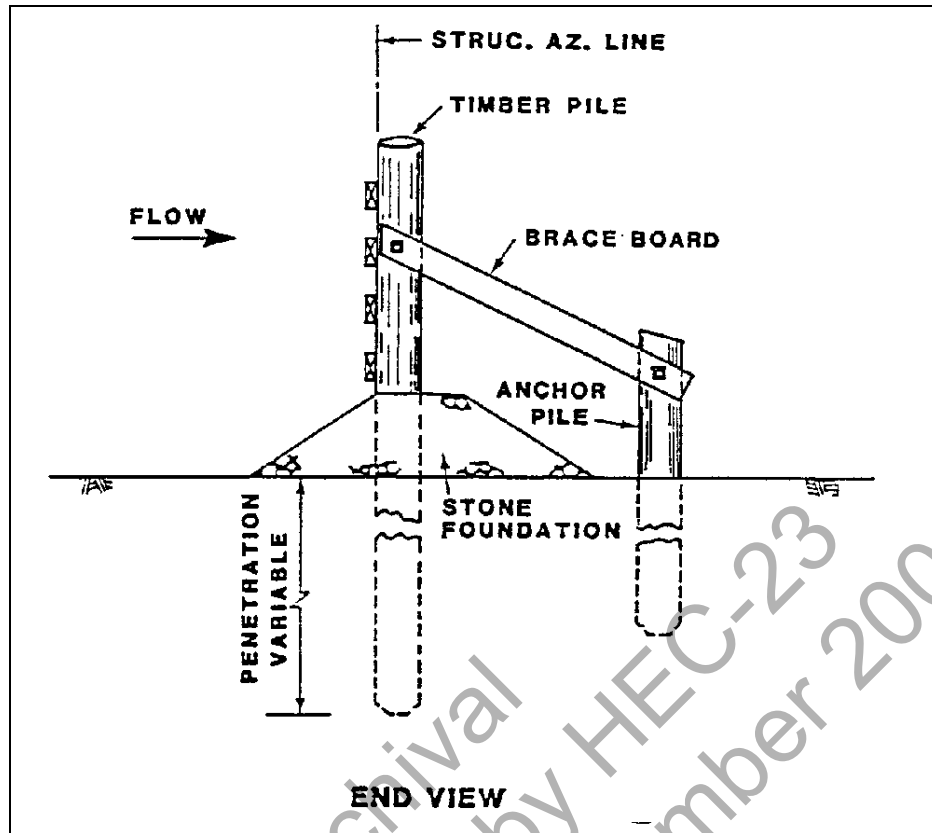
Typical wood fence retarder structure (modified from USACE 1981, after Brown).⁽²⁾
